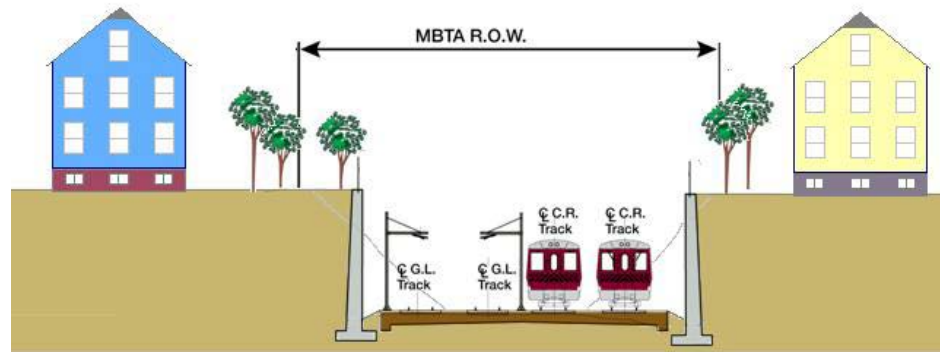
Proposed Section along Medford Branch Looking North
